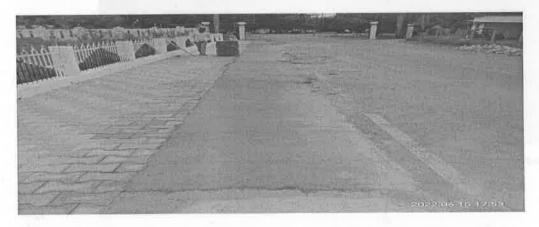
Beautification in the premises of the Collector's office has been done at Janjgir-Champa.
